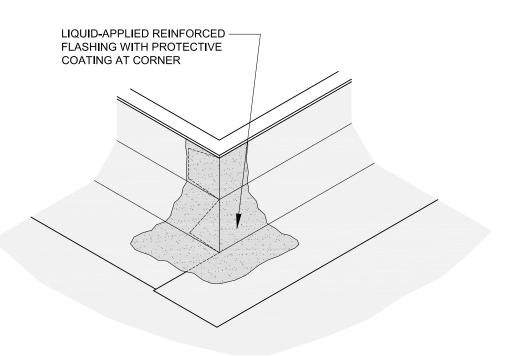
BUR~and~polymer-modified~bitumen~roof~membrane~outside~corner~flashing~application~(continued)
